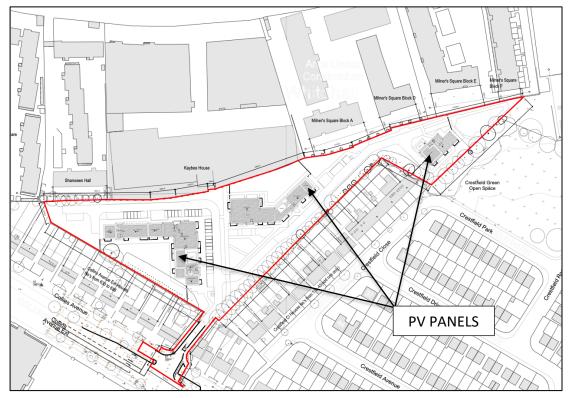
Extract showing the proposed roof layouts with the location of the proposed PV panels.
